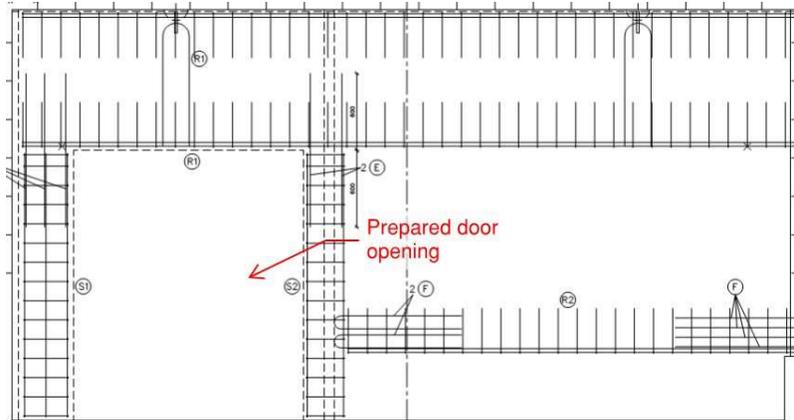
Kanalfronten, reinforcement design in wall element. Part of the technical drawing of the original element prepared for door opening (opening 2). Beside the reinforcement illustrated in the figure, there is a net reinforcement in the whole wall (including the potential door opening) of $\text{Ø}8/150$ in both sides and both directions.³³
